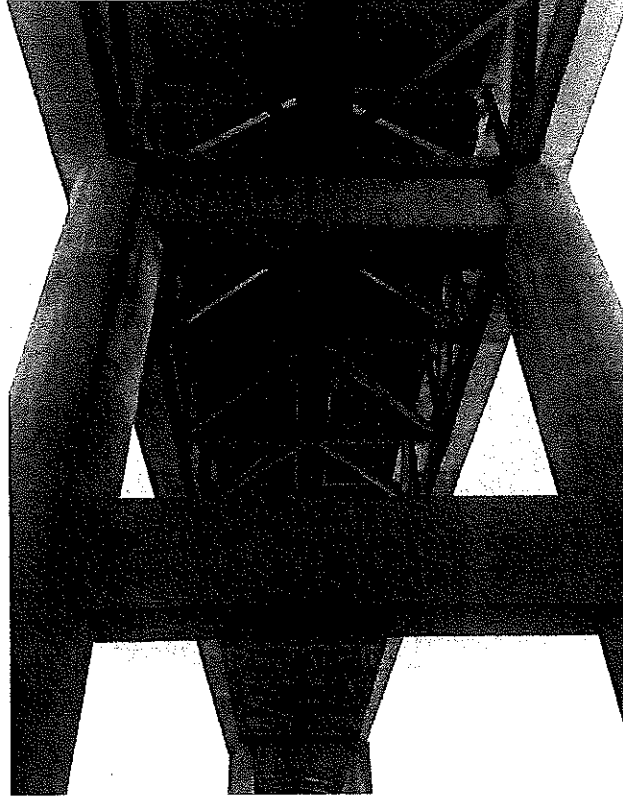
Bulpe Bridge. Pier elevation with top and intermediate cross beams.
